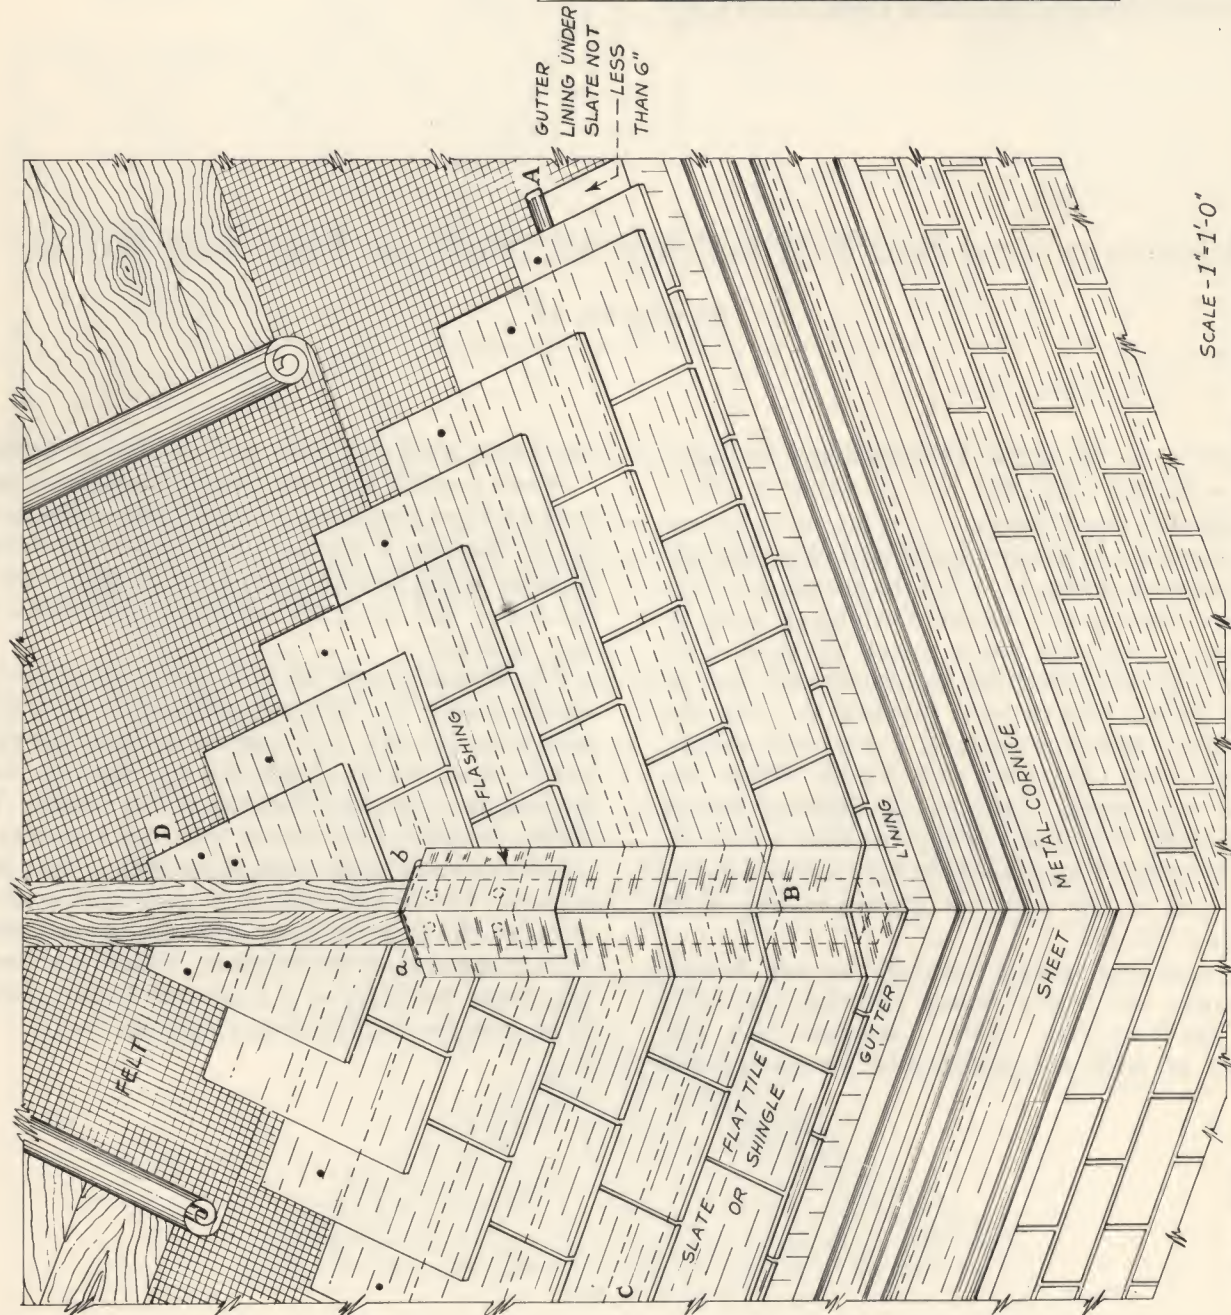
METHOD OF APPLYING FLASHING TO HIP COVERED WITH SLATE - ALSO APPLICABLE TO RIDGE
